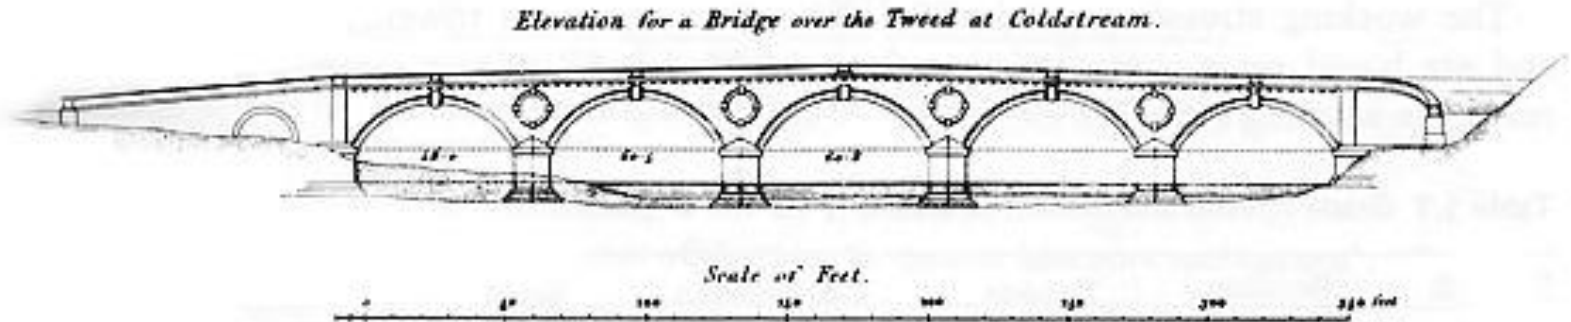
Elevation of masonry Bridge over the Tweed at Coldstream, 1866 (Irwin and Sibbald, 1983)
